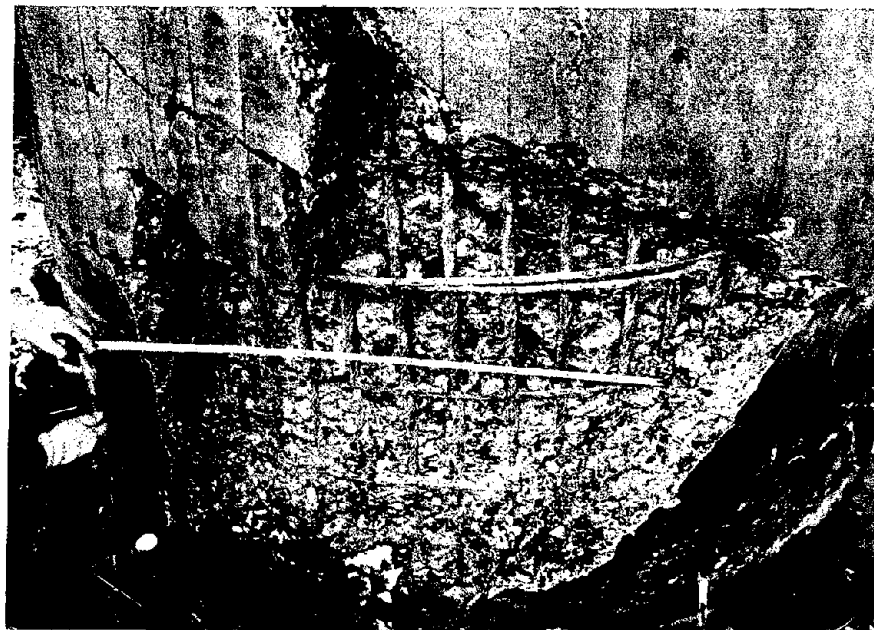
Damaged condition of 3 Pier at Matsunoe Bridge
